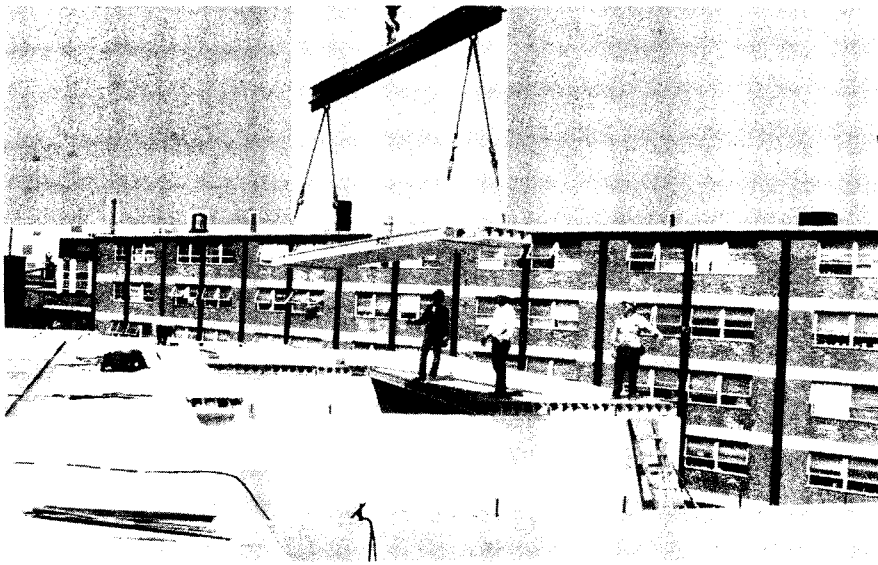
The floors and roof were built with prestressed precast hollow-core concrete slabs, 8 in. (203 mm) thick, that span 23 ft (7 in.) between the load-bearing walls.
